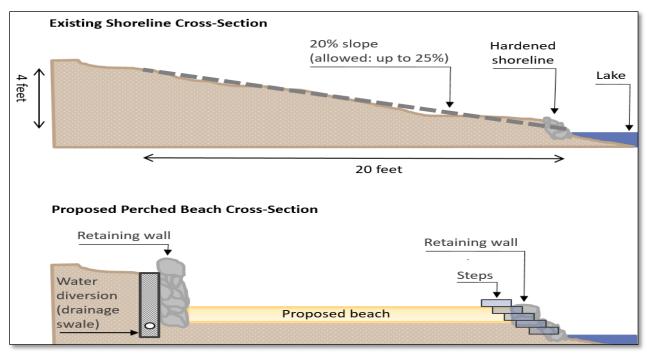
Example proposed water access structure. The proposed beach has zero slope and is landward and above the existing hardened shoreline, which will remain intact except for material that must be removed to install steps to access the water. A drainage swale will also be installed, to divert surface runoff around the water access structure.
